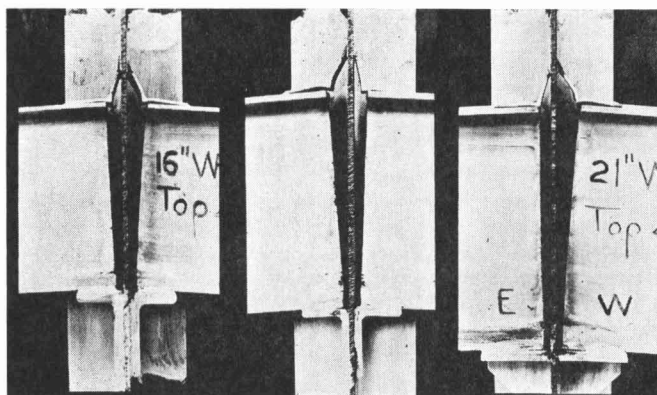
Top and Seat Angle Connections, No. 15, 16 and 17, Respectively, After Testing
